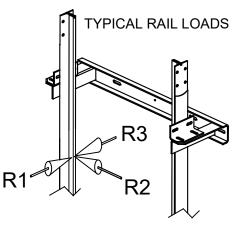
# DETAILS OF THE FOLLOWING SUPPORT GUIDE RAIL / RAIL BRACKETS / BASE PLATE
